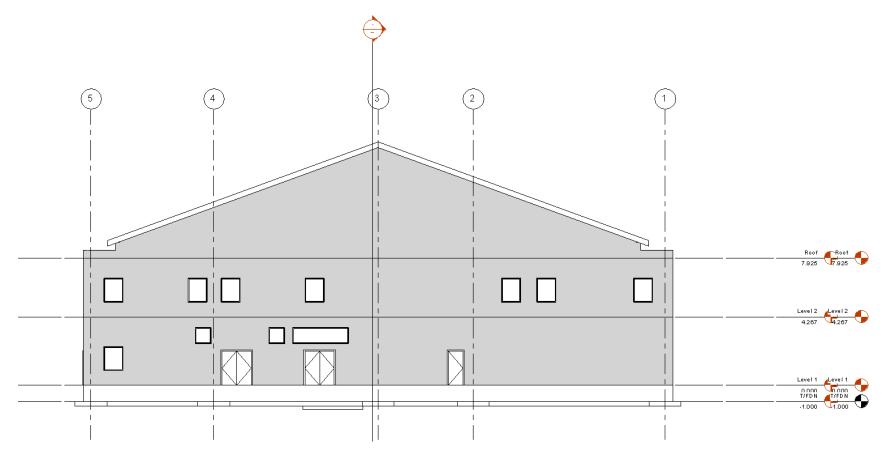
Scaled sample elevation view of a project (Standard office project Revit file from National Building Information Model Standard)
